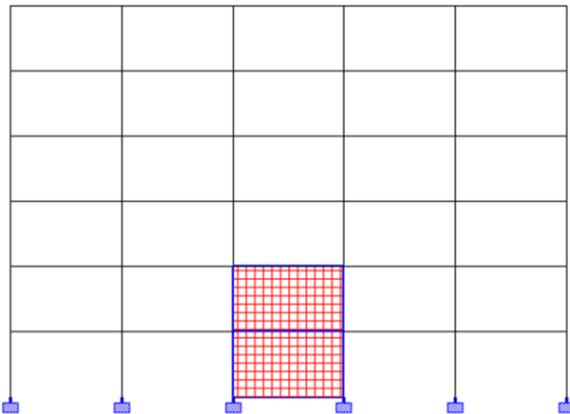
Model 8 – Shear Wall up to 2nd Floor
